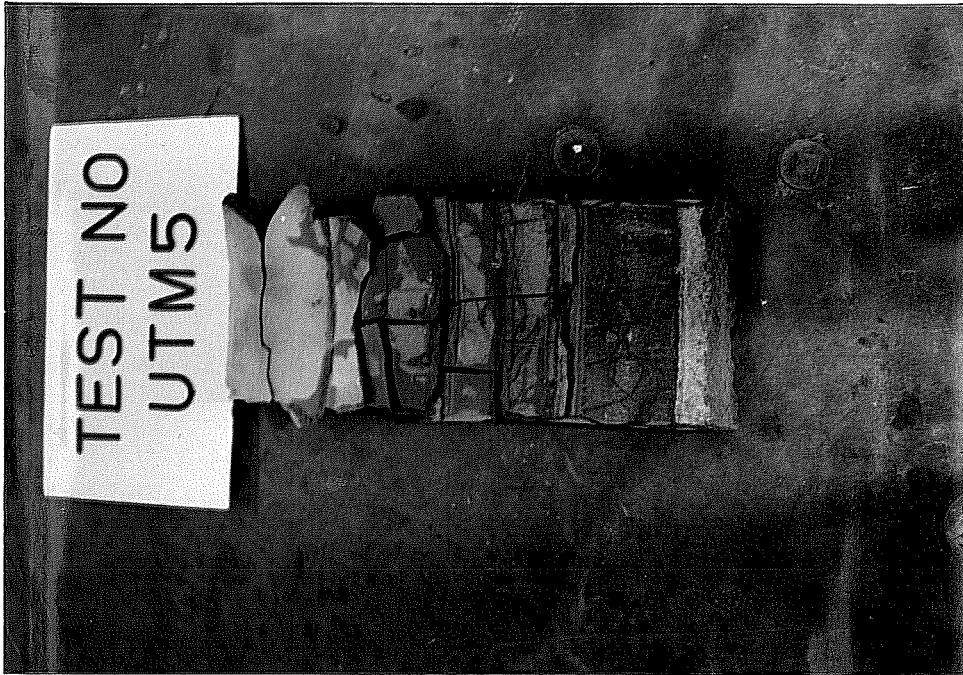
Grout surface on pile side for Specimen UTM5
